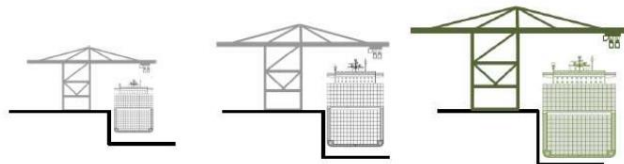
Development of port facilities in Singapore (after Wong & Chng, 2016)
